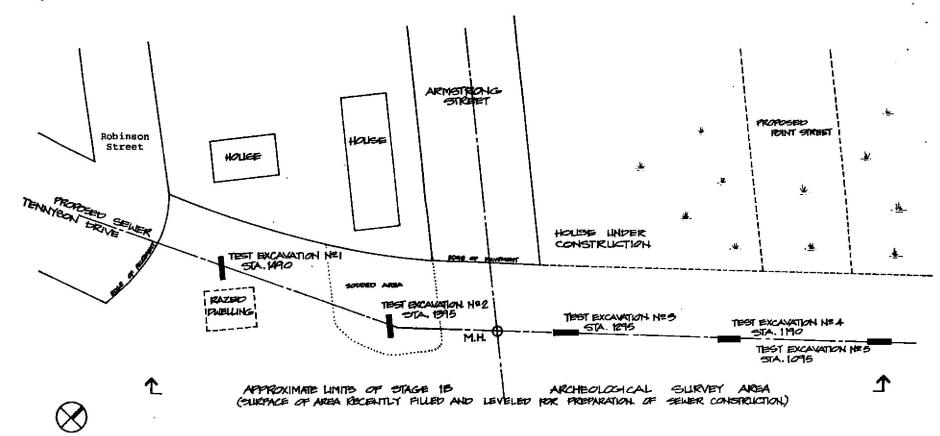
Source: Adapted from Plan and Profile, WP-136 Oakwood Beach WRCP Contract No. 6B-1, West Branch Intercepting Sewer, Borough of Staten Island, June 1982, prepared by NYC Dept. of Environmental Protection, City Bureau of Sewers, Division of Sewer Design, Design and Review Section.
